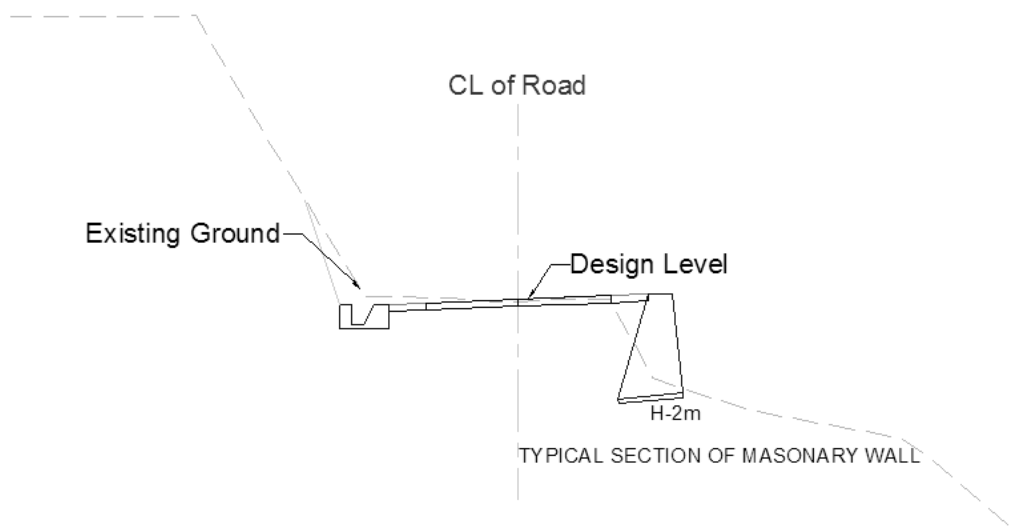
Typical Road Cross Section Showing Stone Masonry Wall
